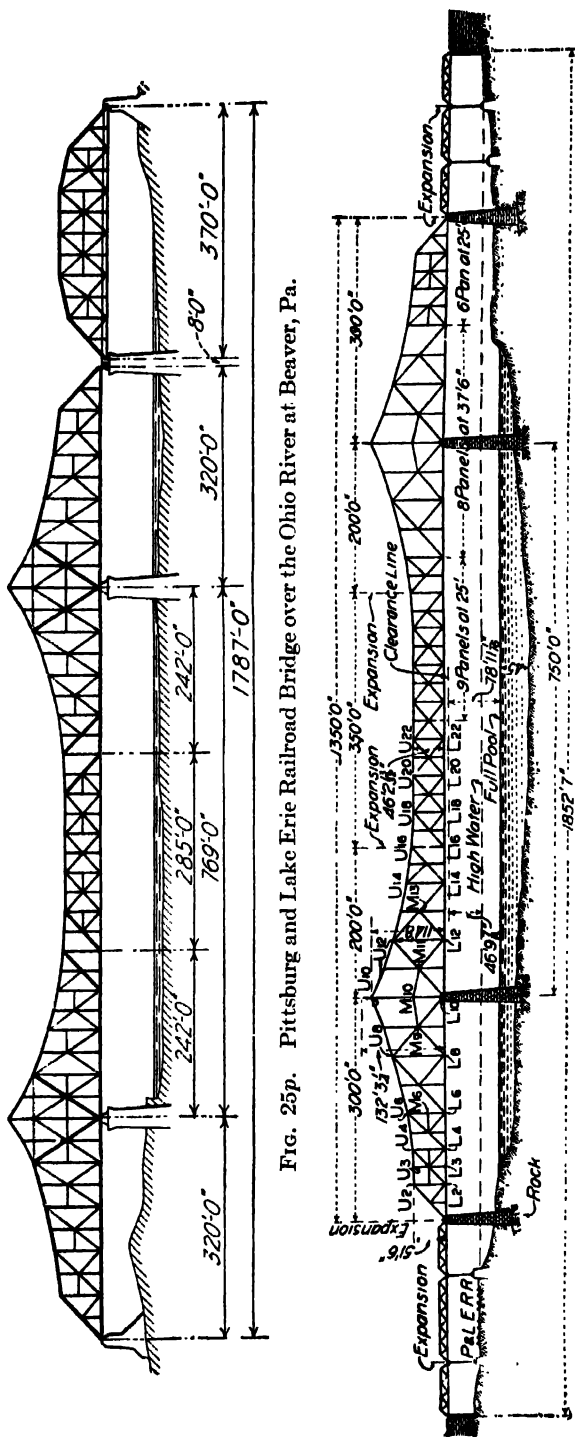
Pittsburgh and Lake Erie Railroad Bridge over the Ohio River at Beaver, Pa.
